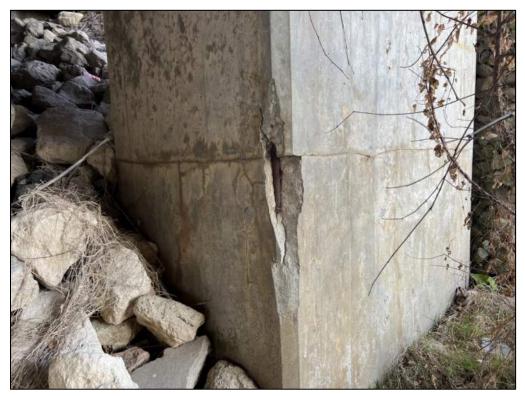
Pier 4 - West Face (spall, delamination, and light scaling)
